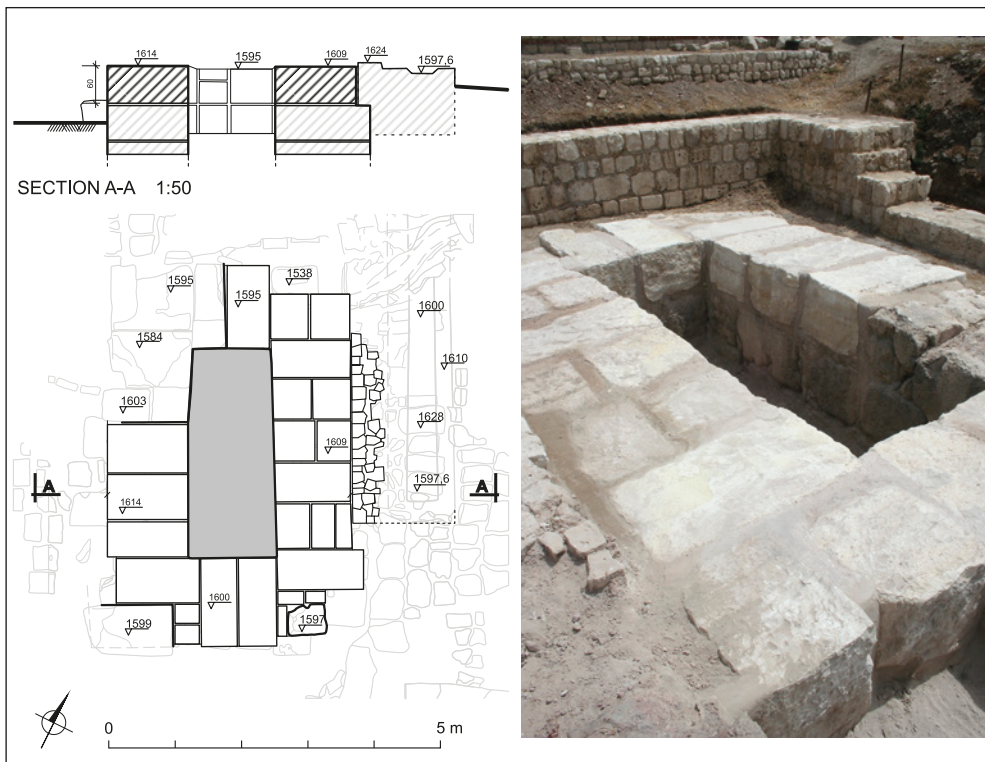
Southwestern well in the cistern: left, plan; right, view after restoration (Drawing and photo A. Pisarzewski)
